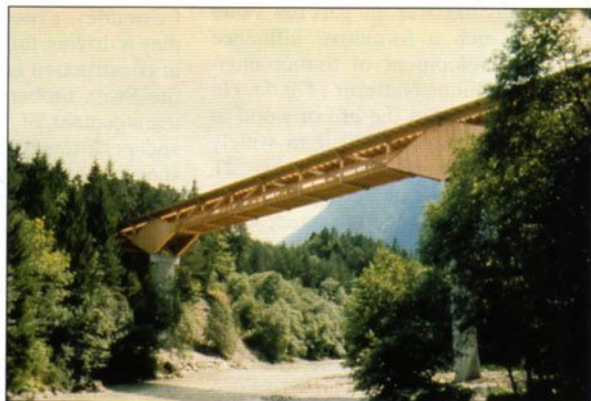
The bridge over the Simme in Wimmis, Switzerland built in 1989 consists of a truss structure
